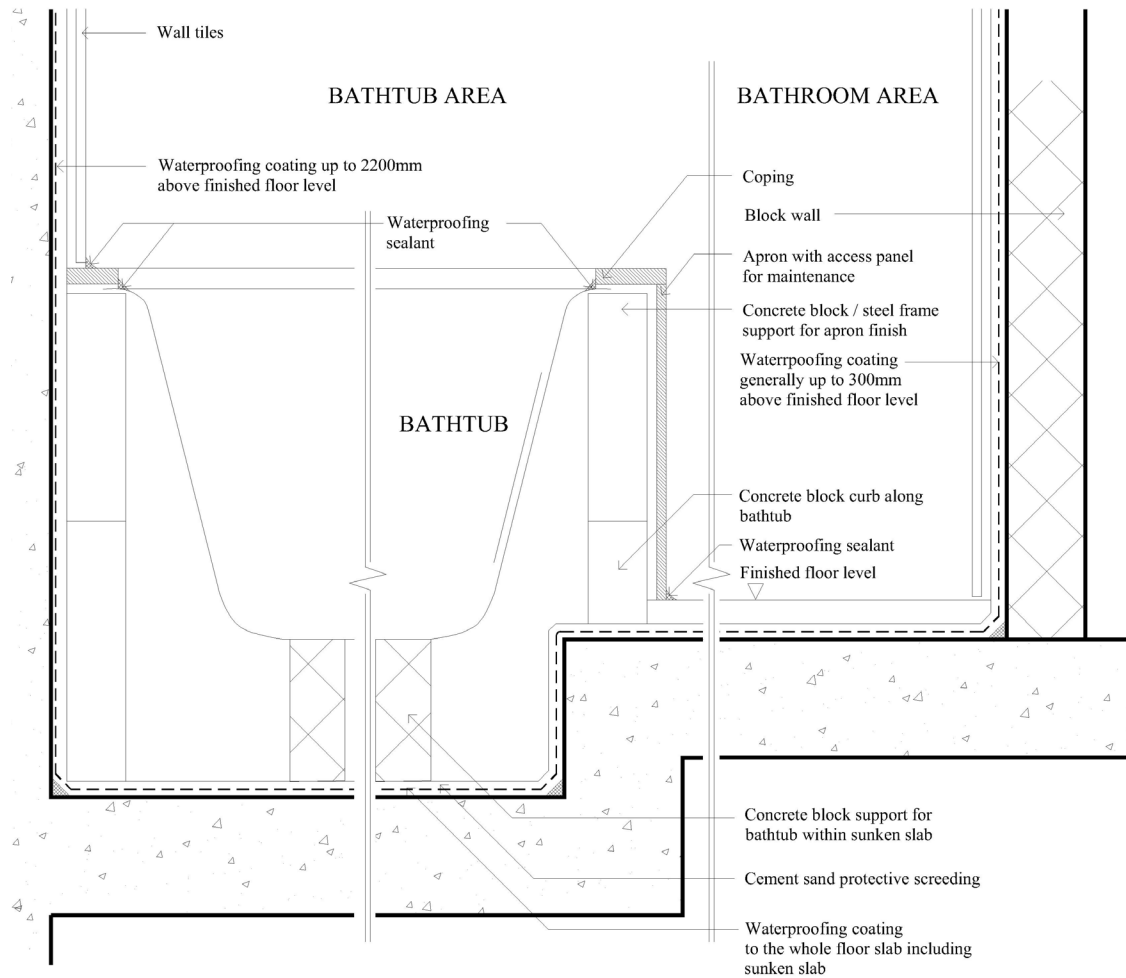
A Homogenous Layer of Waterproofing Coating for Bathroom and/or Toilet with Sunken Slab
